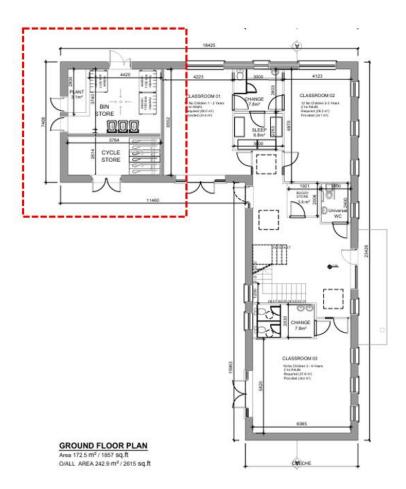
Proposed Crèche Floor Plan illustrating internal bin and bike storage facility
